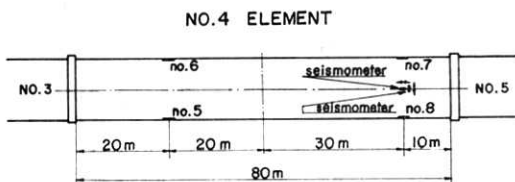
Arrangement of seismometer and strainmeter in No. 4 Tube element
